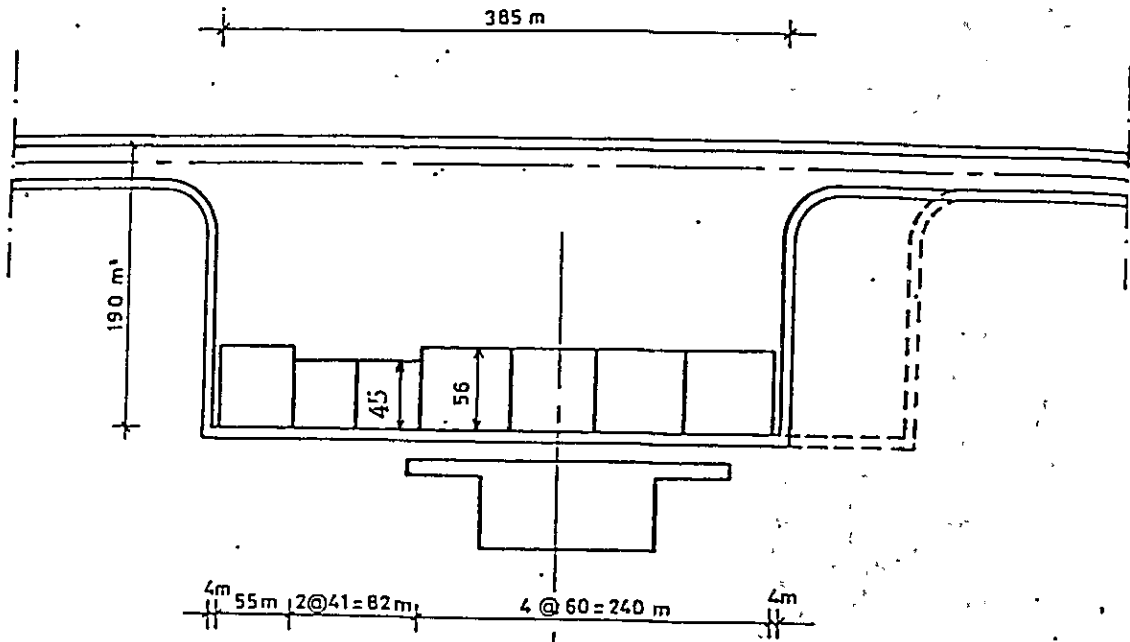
AIRPORT LAYOUT PLAN AT KETAPING
